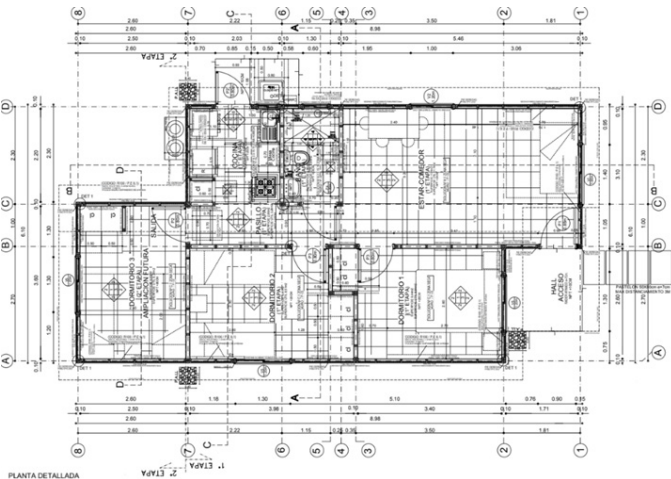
Architecture floor plan, mass construction typology. Source: Preparation by the authors
